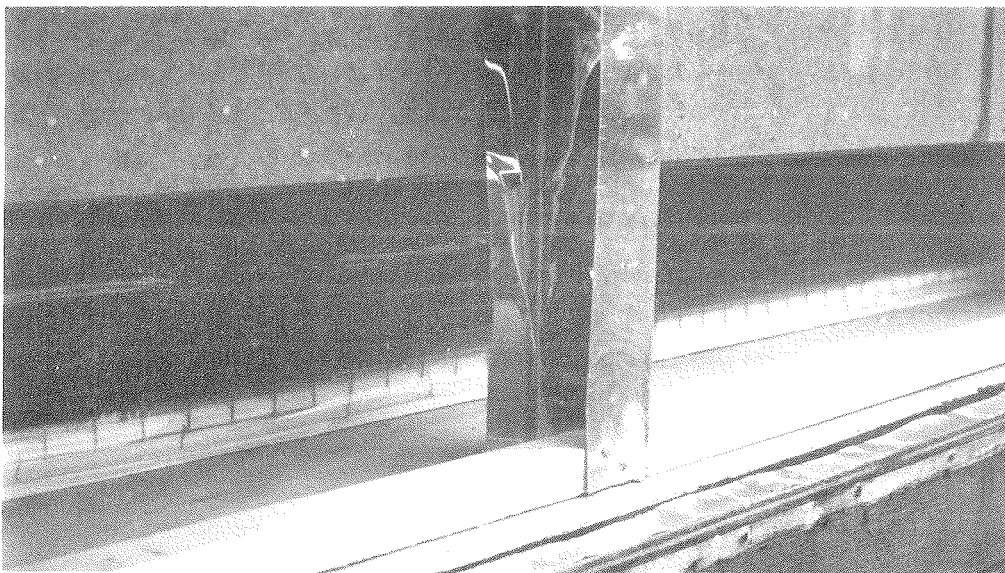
Bottom damper of the internally ventilated Trombe wall. Note the aluminium profile and lath to keep the absorber plane.
